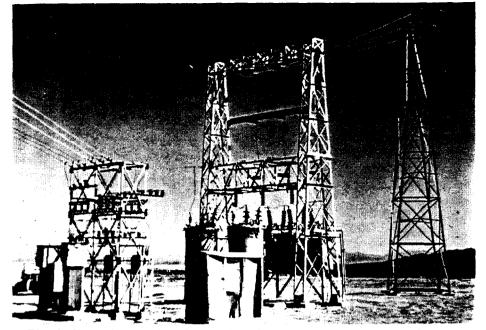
View of the substation at 4700-foot area after the blast. Note the damaged instrument cubicle.
